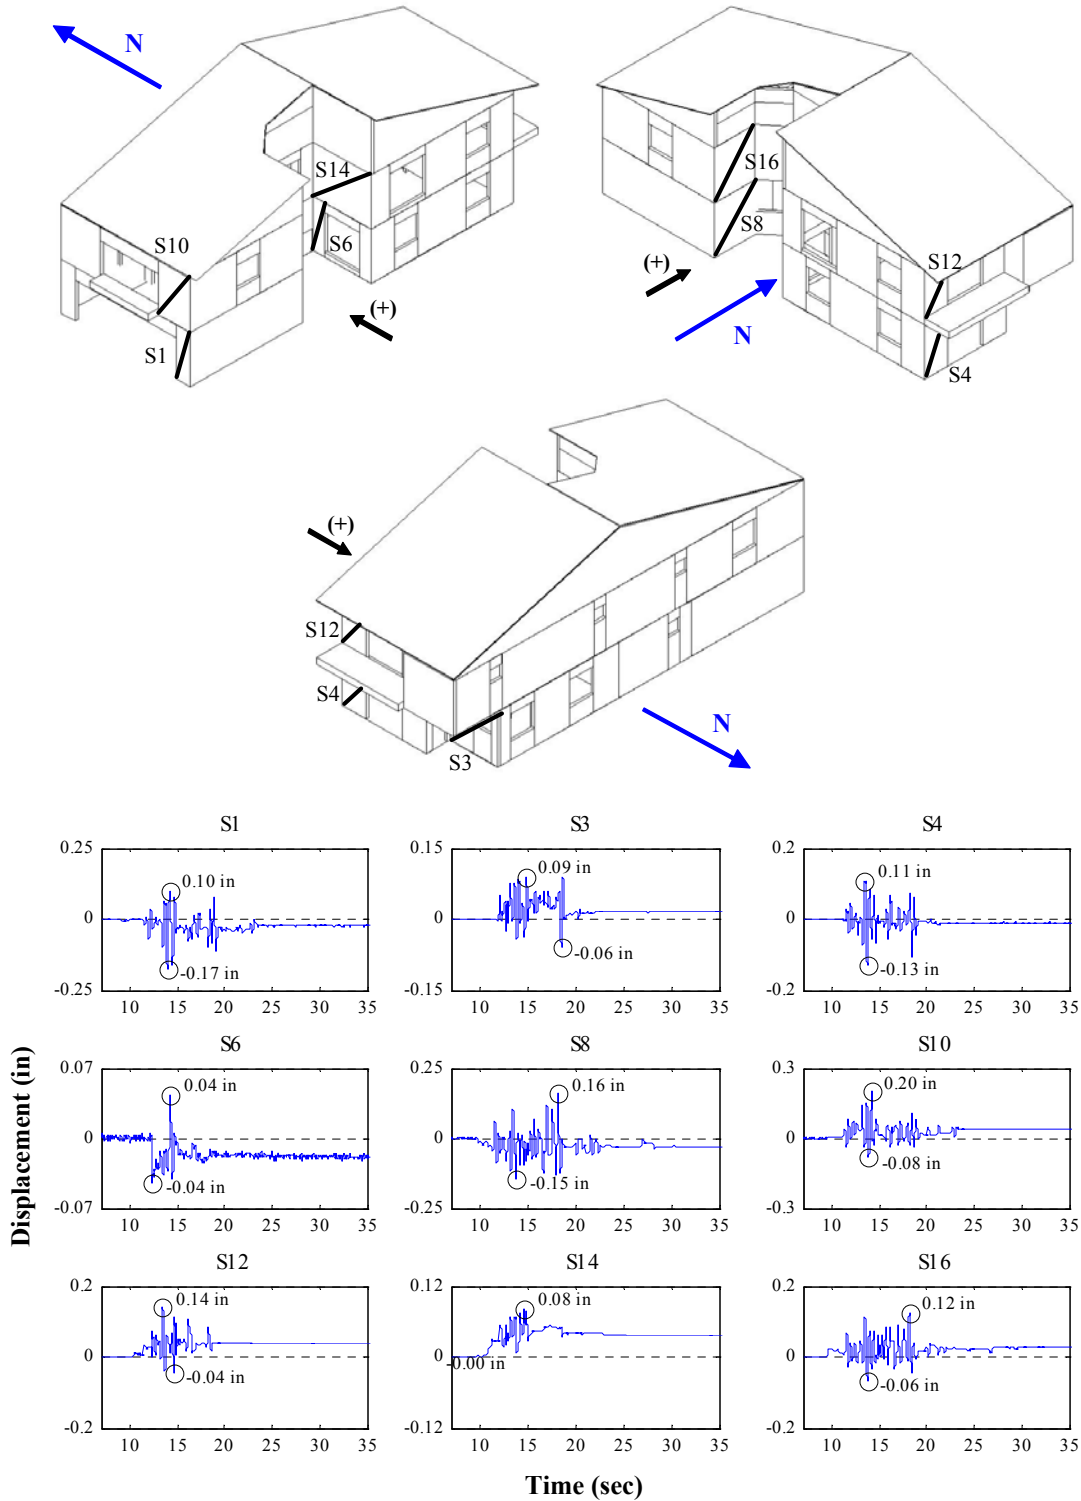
Wall deformations of north-south external walls for Test NWP2S27
